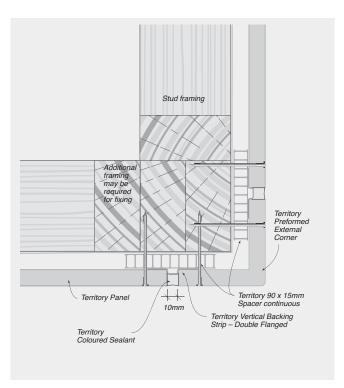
External Corner Detail – with Aluminium External Corner
